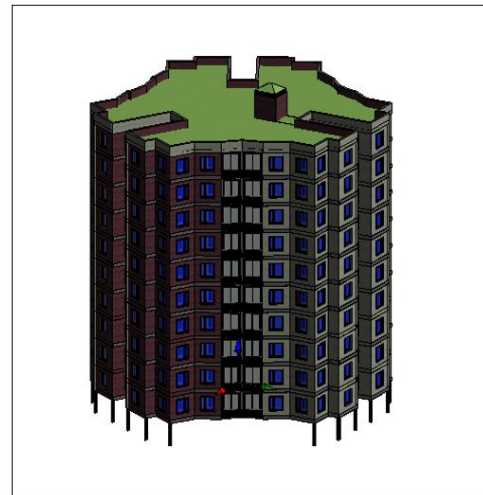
AutoCAD plan of G+10 Residential Building.
